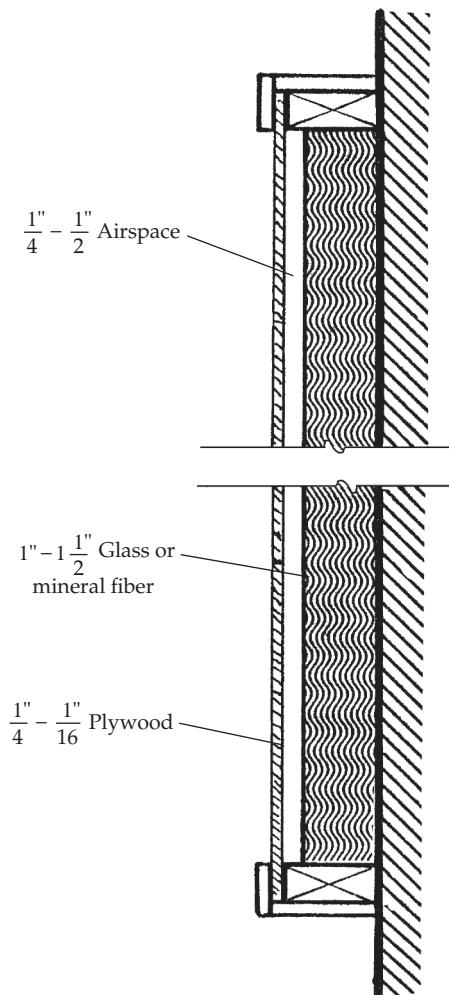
Typical resonant panel absorber with wall mounting.
